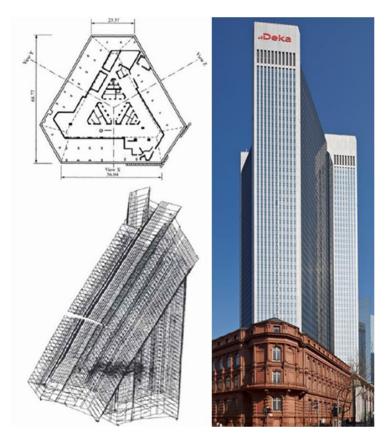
Characteristic Floor Plan of Trianon Building (left-top), Schematic Scenario of Possible Collapse (left-bottom) and Trianon Building, 1992, completed (right) [18,19]
